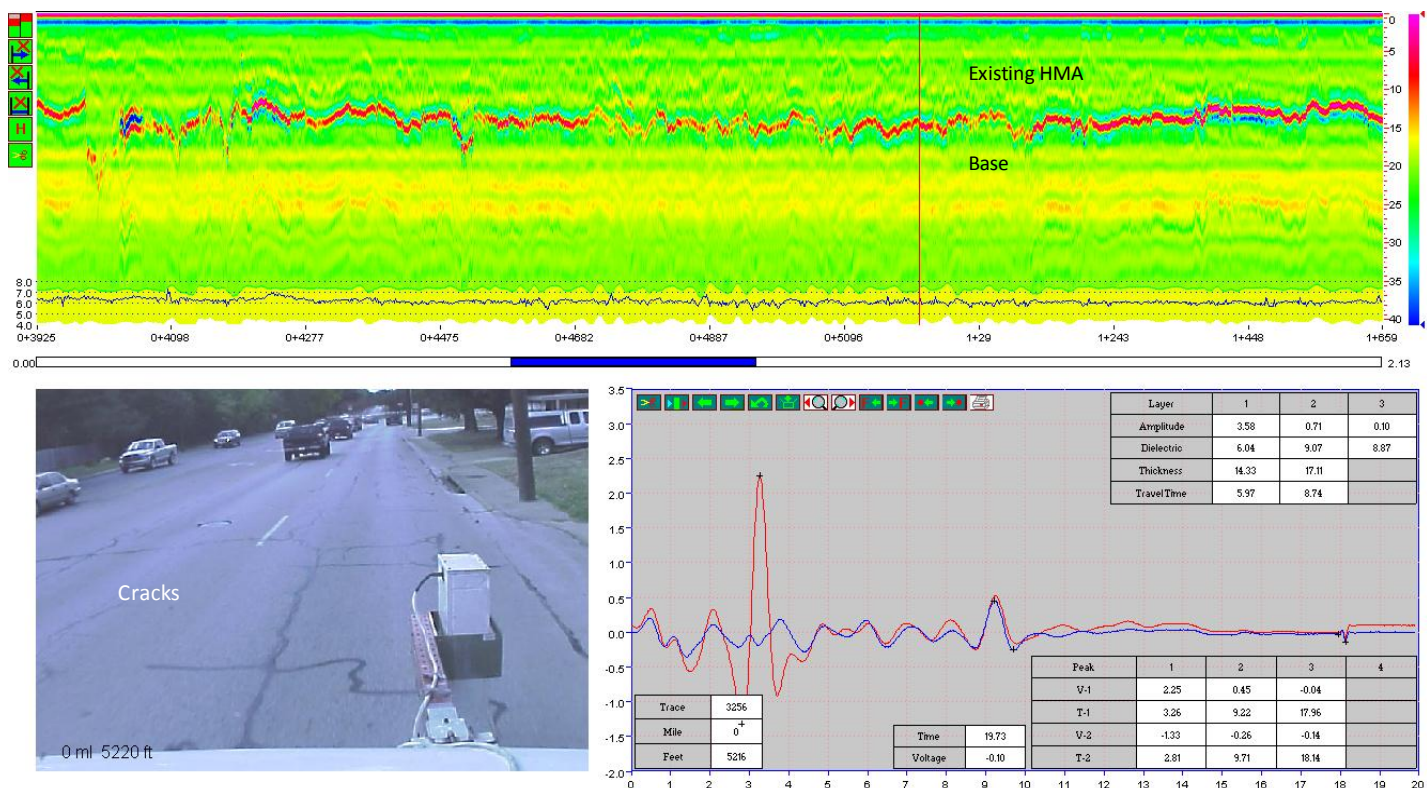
GPR Test Run on WB Outside Lane Prior to Overlay Placement.
